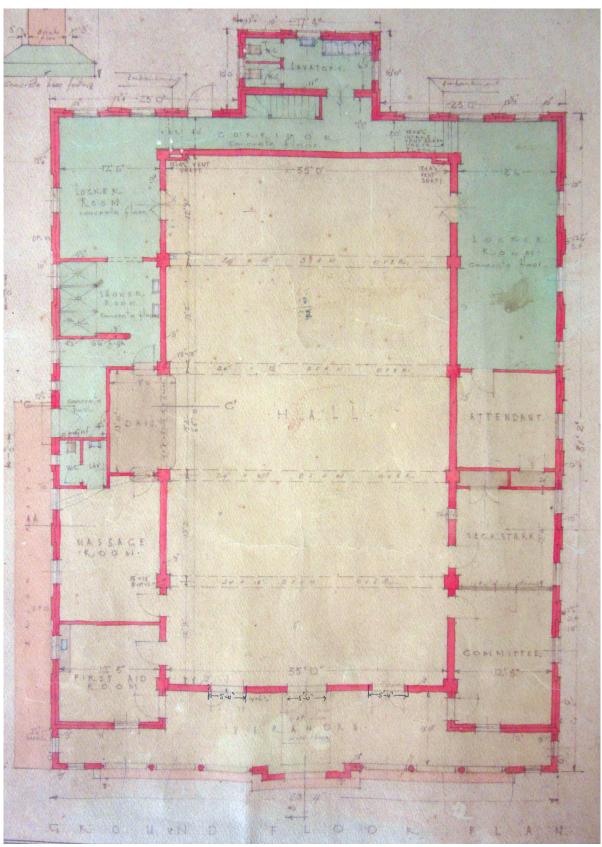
The ground floor plan shows the rooms similar to the plan Index No 432619 but that plan has a side passage that was not built. Instead the attendants room and cupboards were built as shown on this plan. Note the colours are the standard drawing convention, green indicates concrete flooring to the wet areas, red indicates brick and yellow indicates timber. Source: Waverley Council Index No 432616
